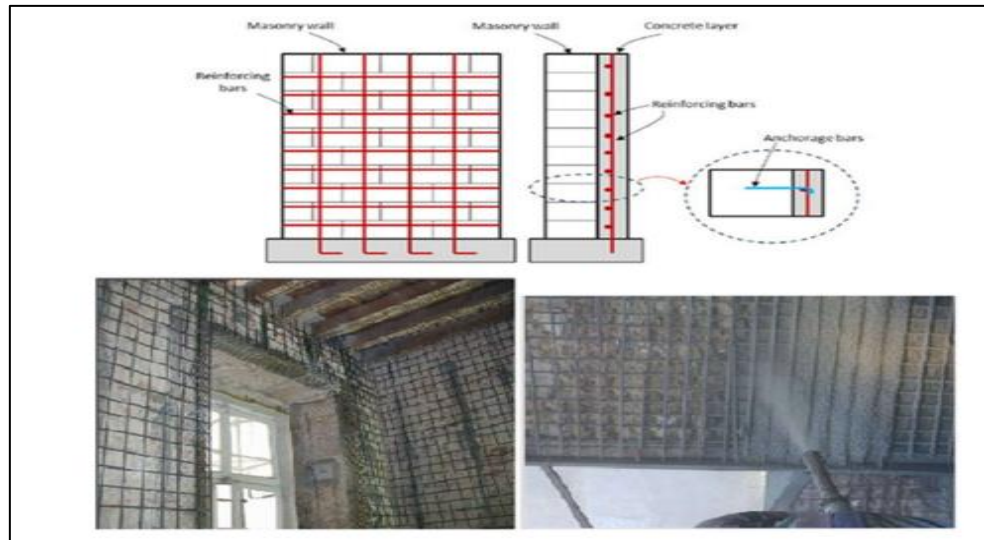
Reinforced concrete wall as a strengthening masonry [11]
